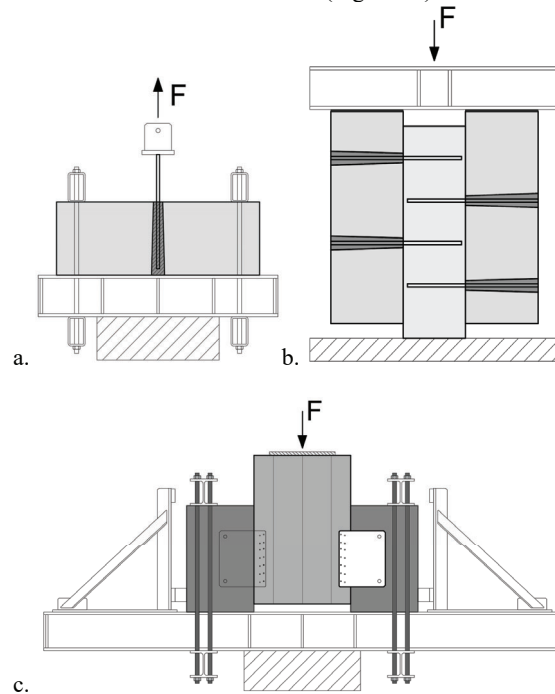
Test setup: a) anchor system of beam element tensile test; b) beam-to-slab connection shear test; c) panel-to-beam connection shear test
